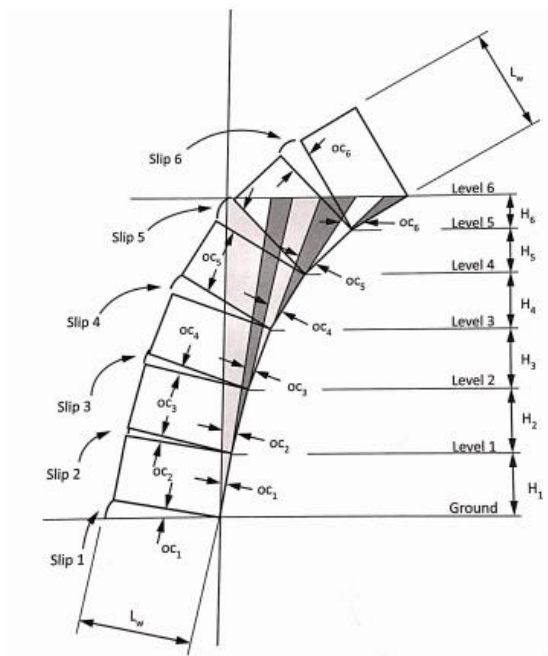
Deflection Due to Vertical Elongation of the Wall Anchorage System (CSA 2014)
